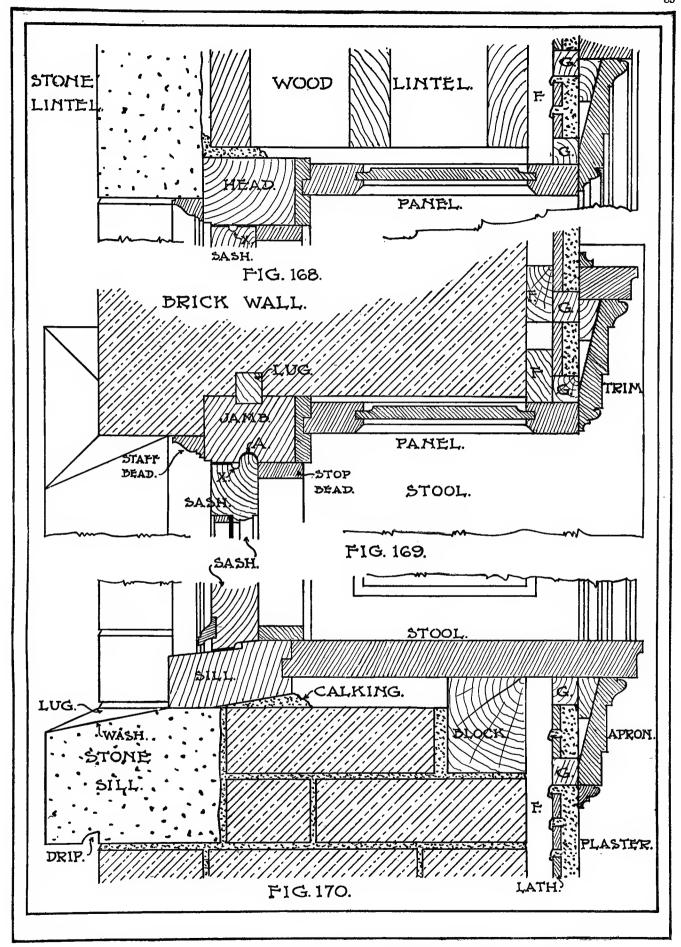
OUTWARD OPENING CASEMENT IN BRICK WALL
